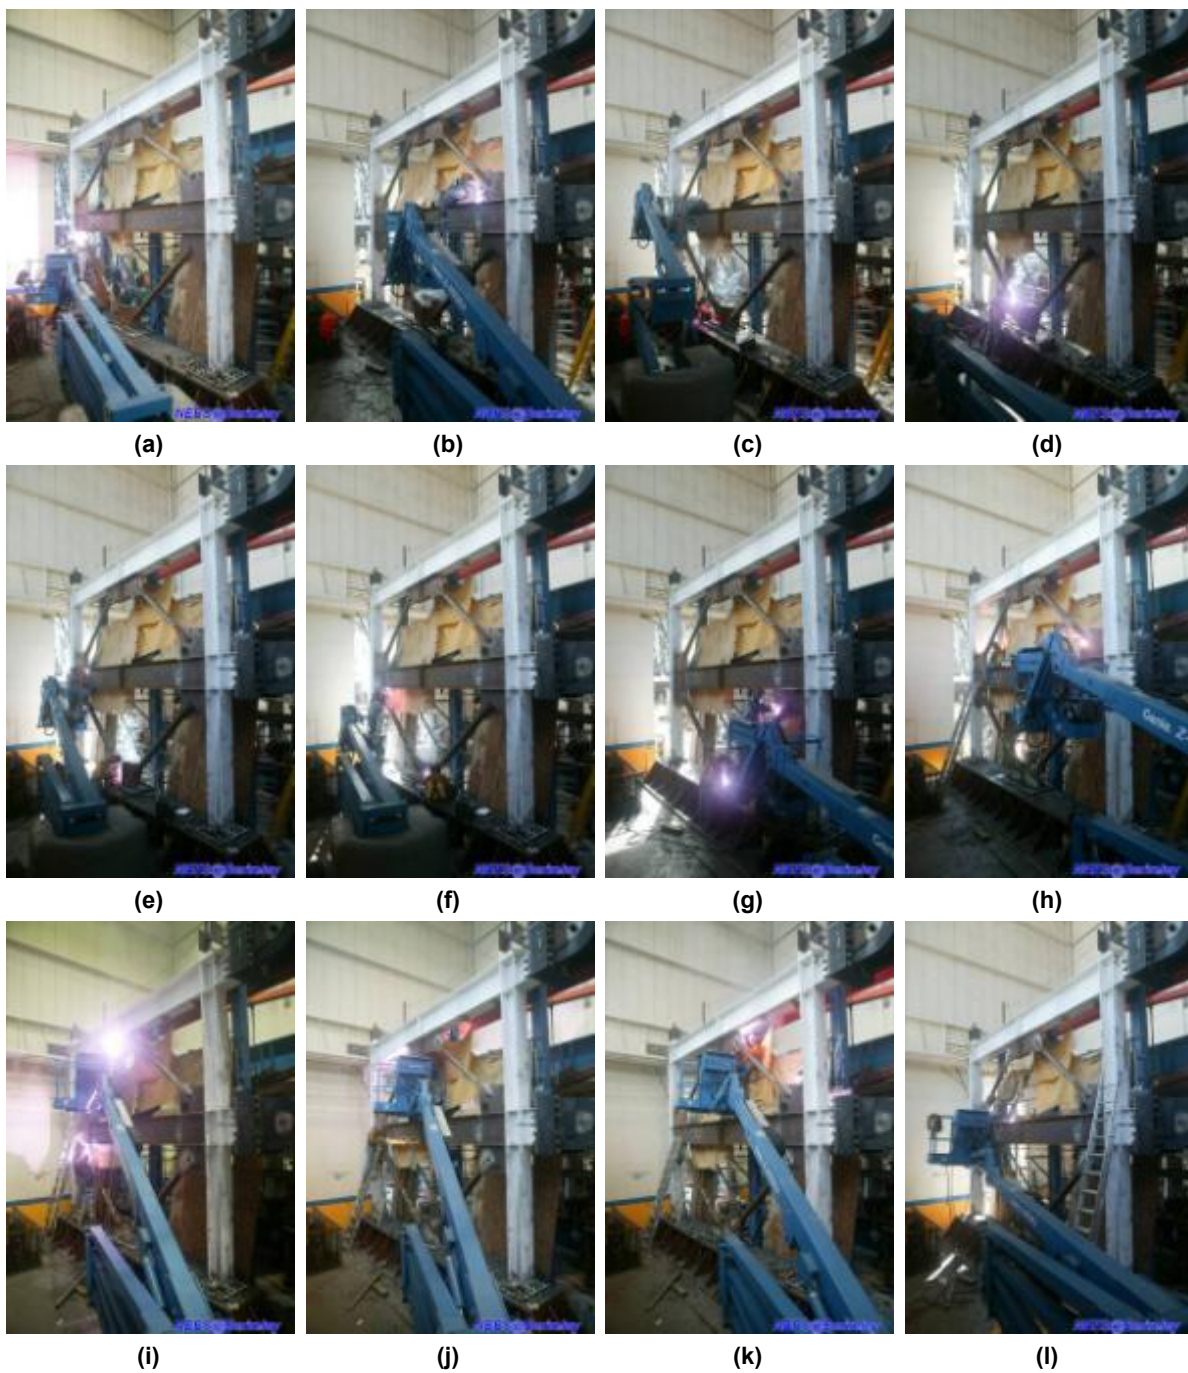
Specimen TCBF-B-2: key welding processes.
